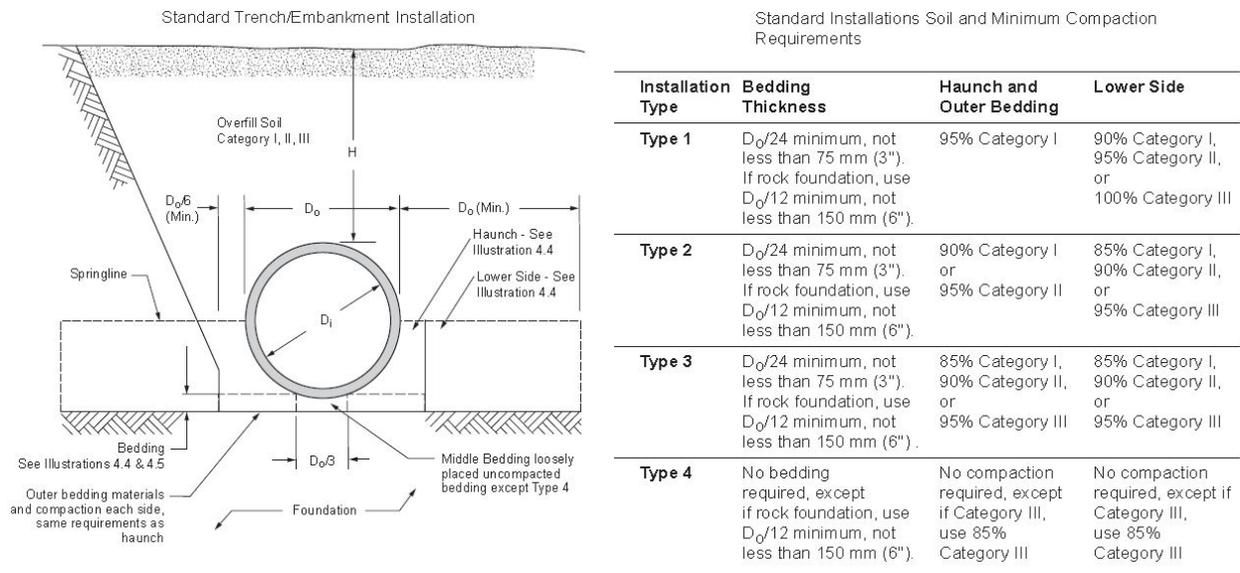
Standard Installation Direct Design for Concrete Pipe
